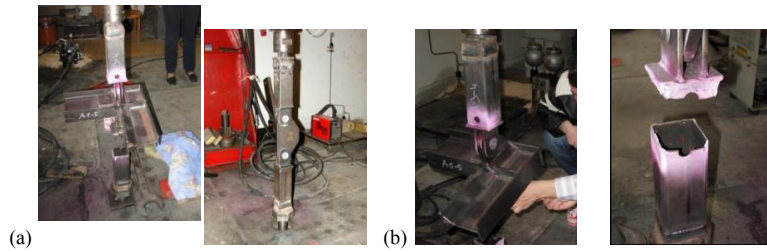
Connections of short footbridge: (a) two types of tested specimens – with and without transverse frame (simplified); (b) typical failure mode – failure of end parts near welds.
